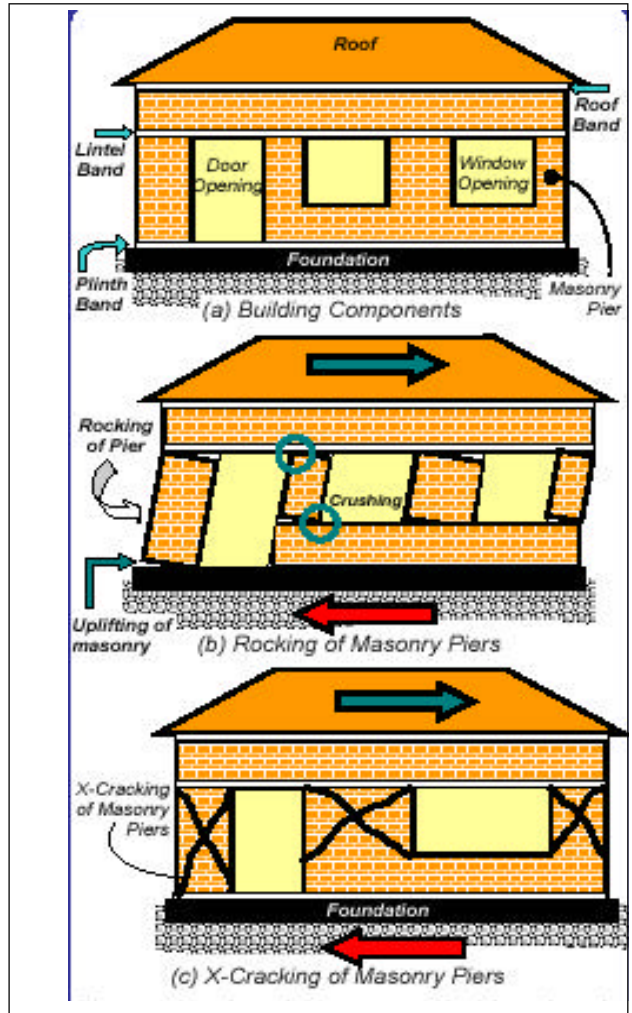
Earthquake response of a hipped roof masonry building – no vertical reinforcement is provided in walls.
